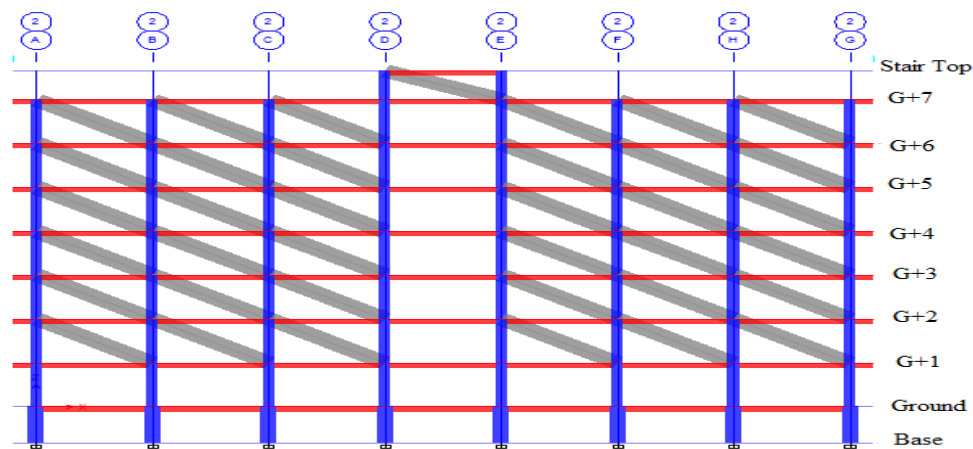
11 Sample Elevation view of soft storey modeling at ground floor
